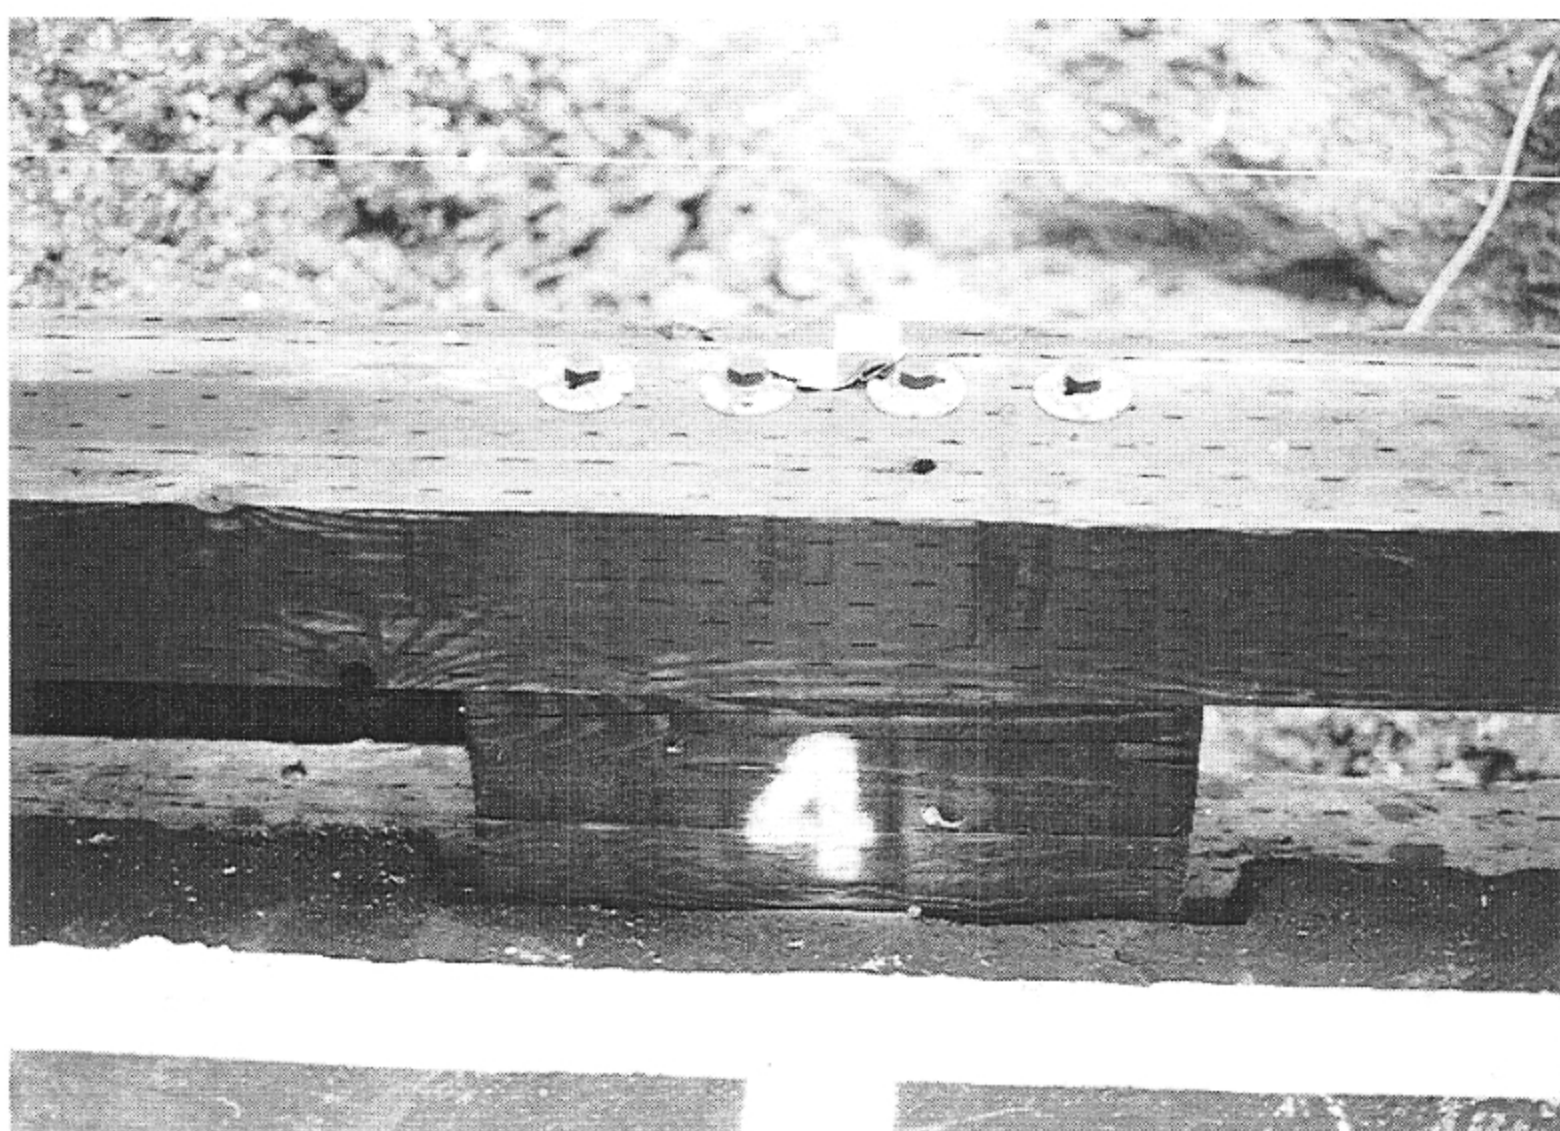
Connection Detail Between Glulam Rail, Scupper Blocks, and Bridge Deck
